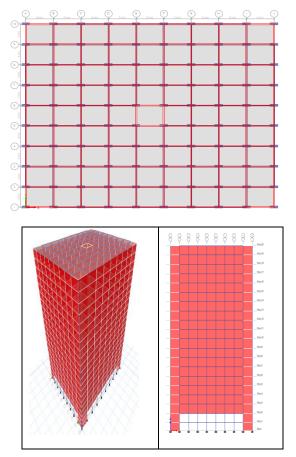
Plan layout, 3D and Elevation view of Model-4.
